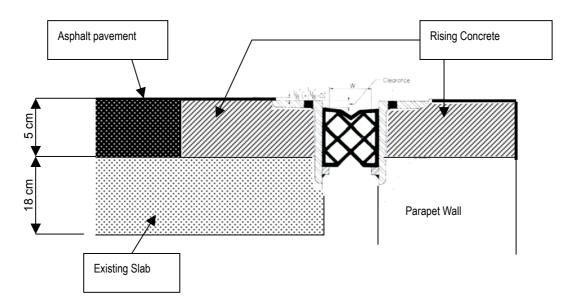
Example of Method for Fixing New Expansion Joint
